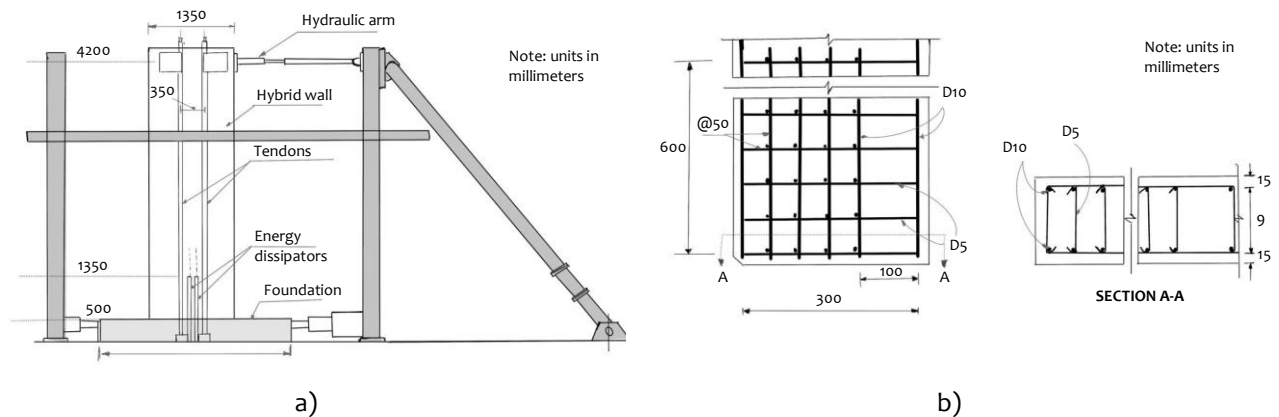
HW3 wall schematic tested by Rahman et al. a) hybrid wall schematic. b) confinement reinforcement at the lower end of the wall
